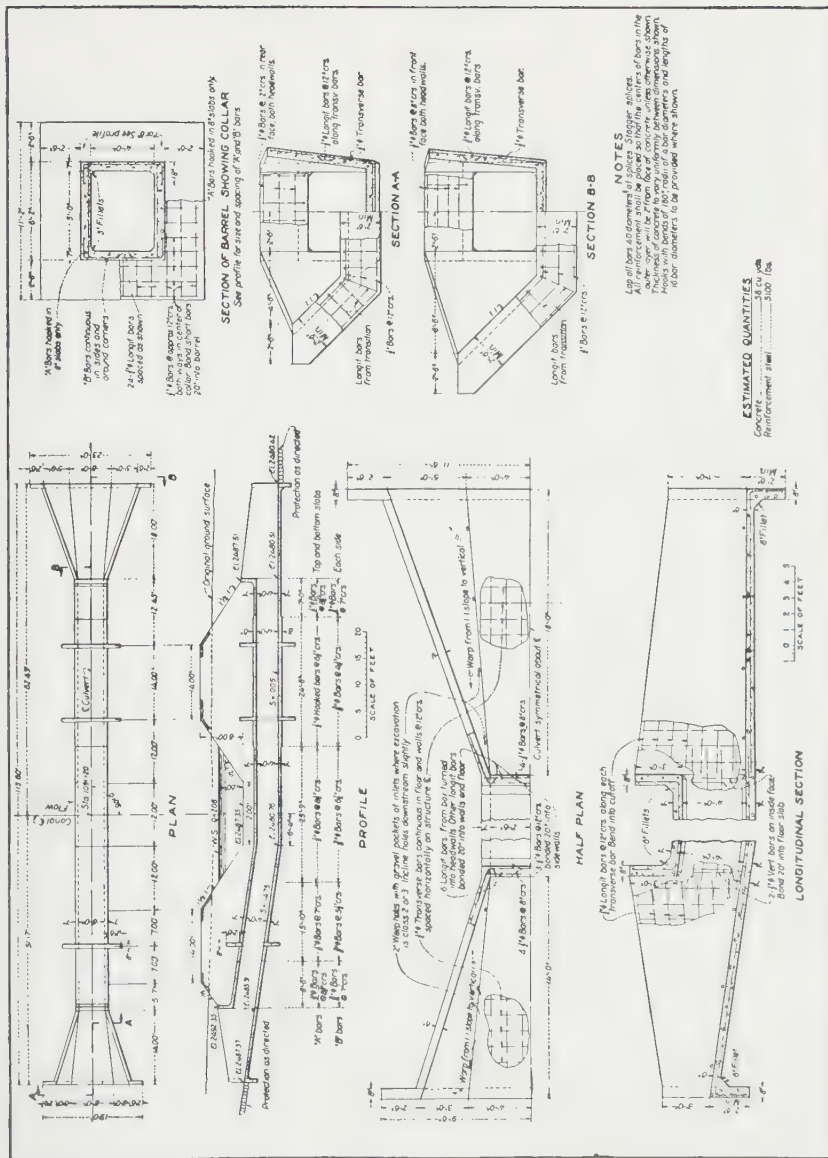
Box culvert on South Canal, Sucor Creek division, Owyhee project, Idaho.
